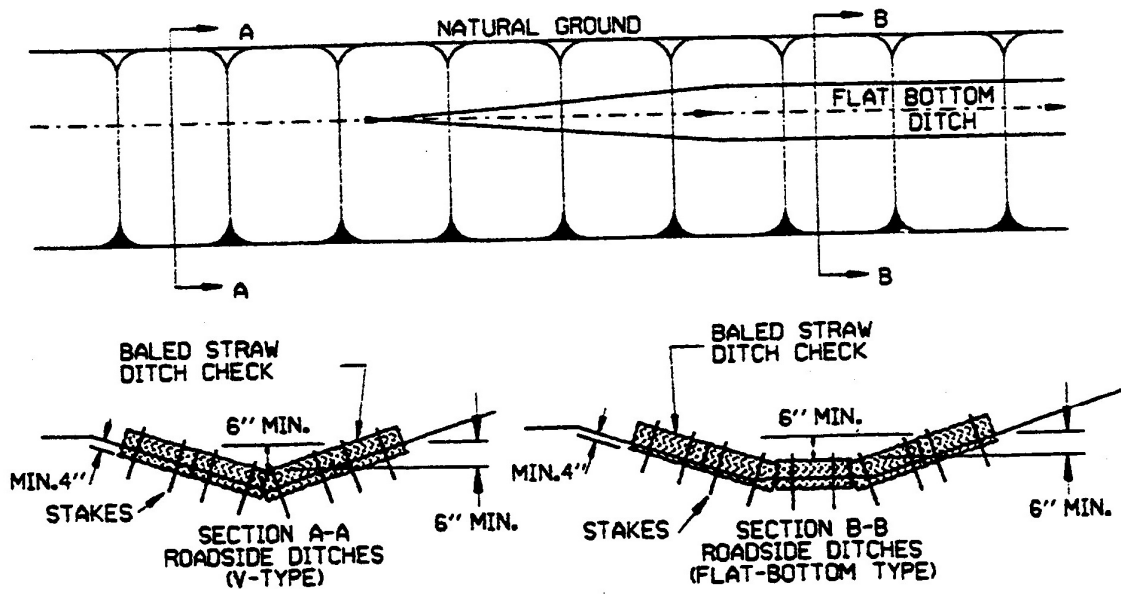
Baled straw check dam detail. (Source: AHTD, 2001)
